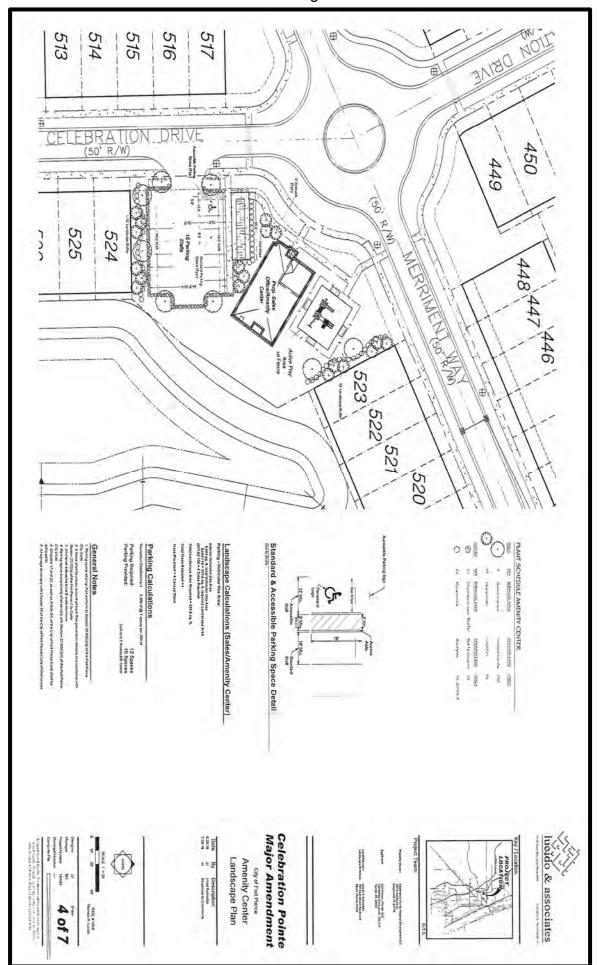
EXHIBIT A Sheet A4 Major Modification to Planned Development Lot 319 Through Lot 610
